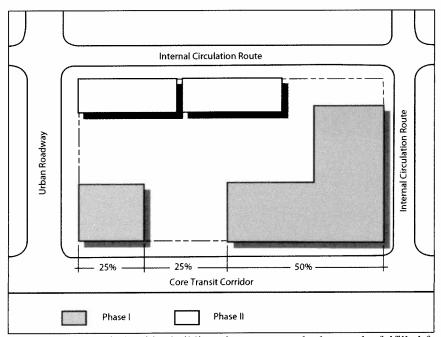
Core Transit Corridor building placement standards must be fulfilled for the block adjacent to streets identified is Subsection (A) before additional buildings may be built within that block.
